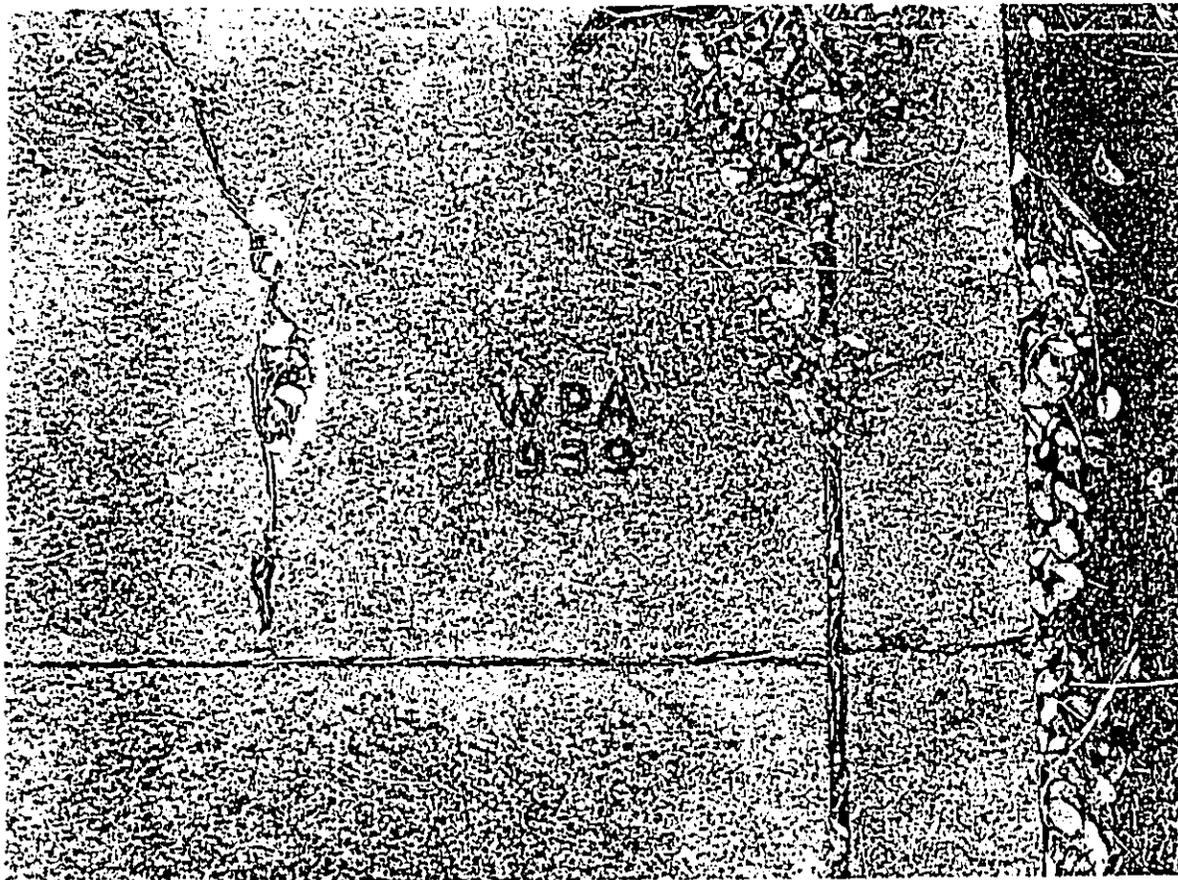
Detail of concrete sidewalk mark south of Wells Street and Market Street intersection—outside the project area.
